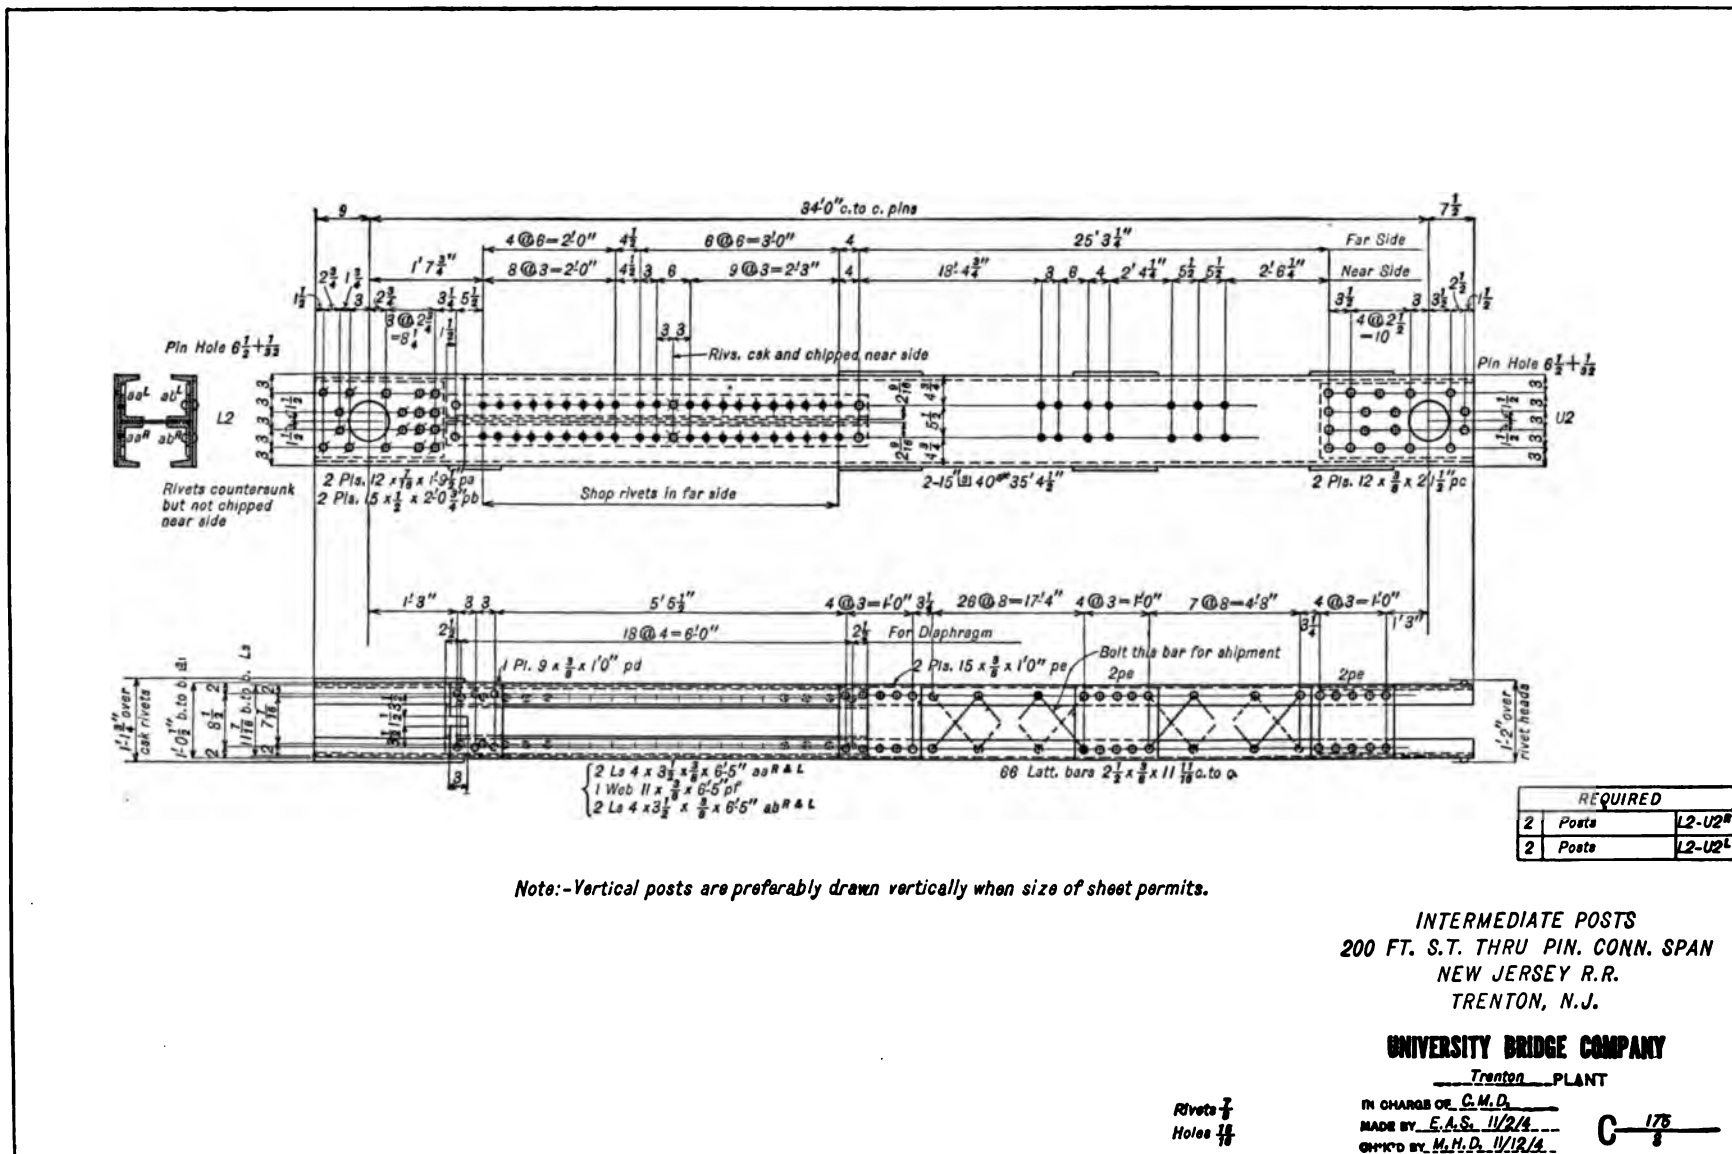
Posts for Pin-connected Truss Shown on Preceding Page.
